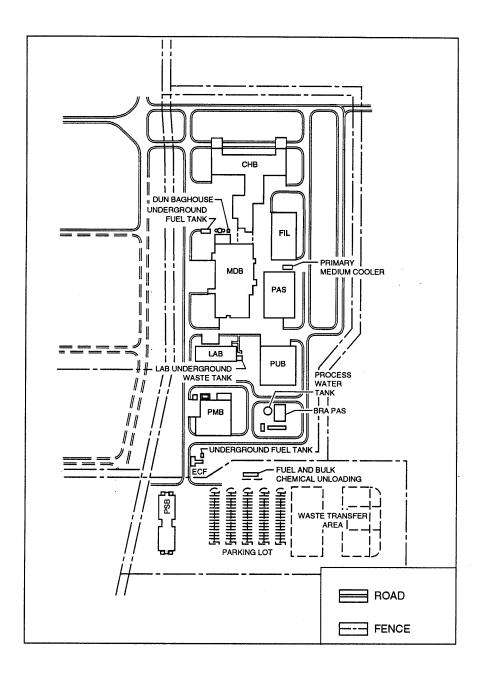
Site plan for the baseline destruction facility at the Pueblo Chemical Depot.
